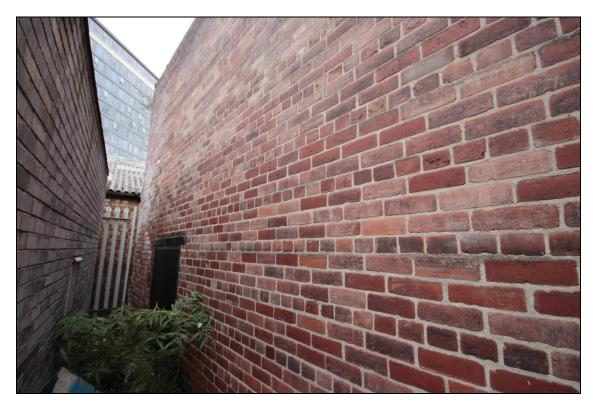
The far eastern end of the north western elevation, facing north east. The brick building to the left is the electrical substation.
